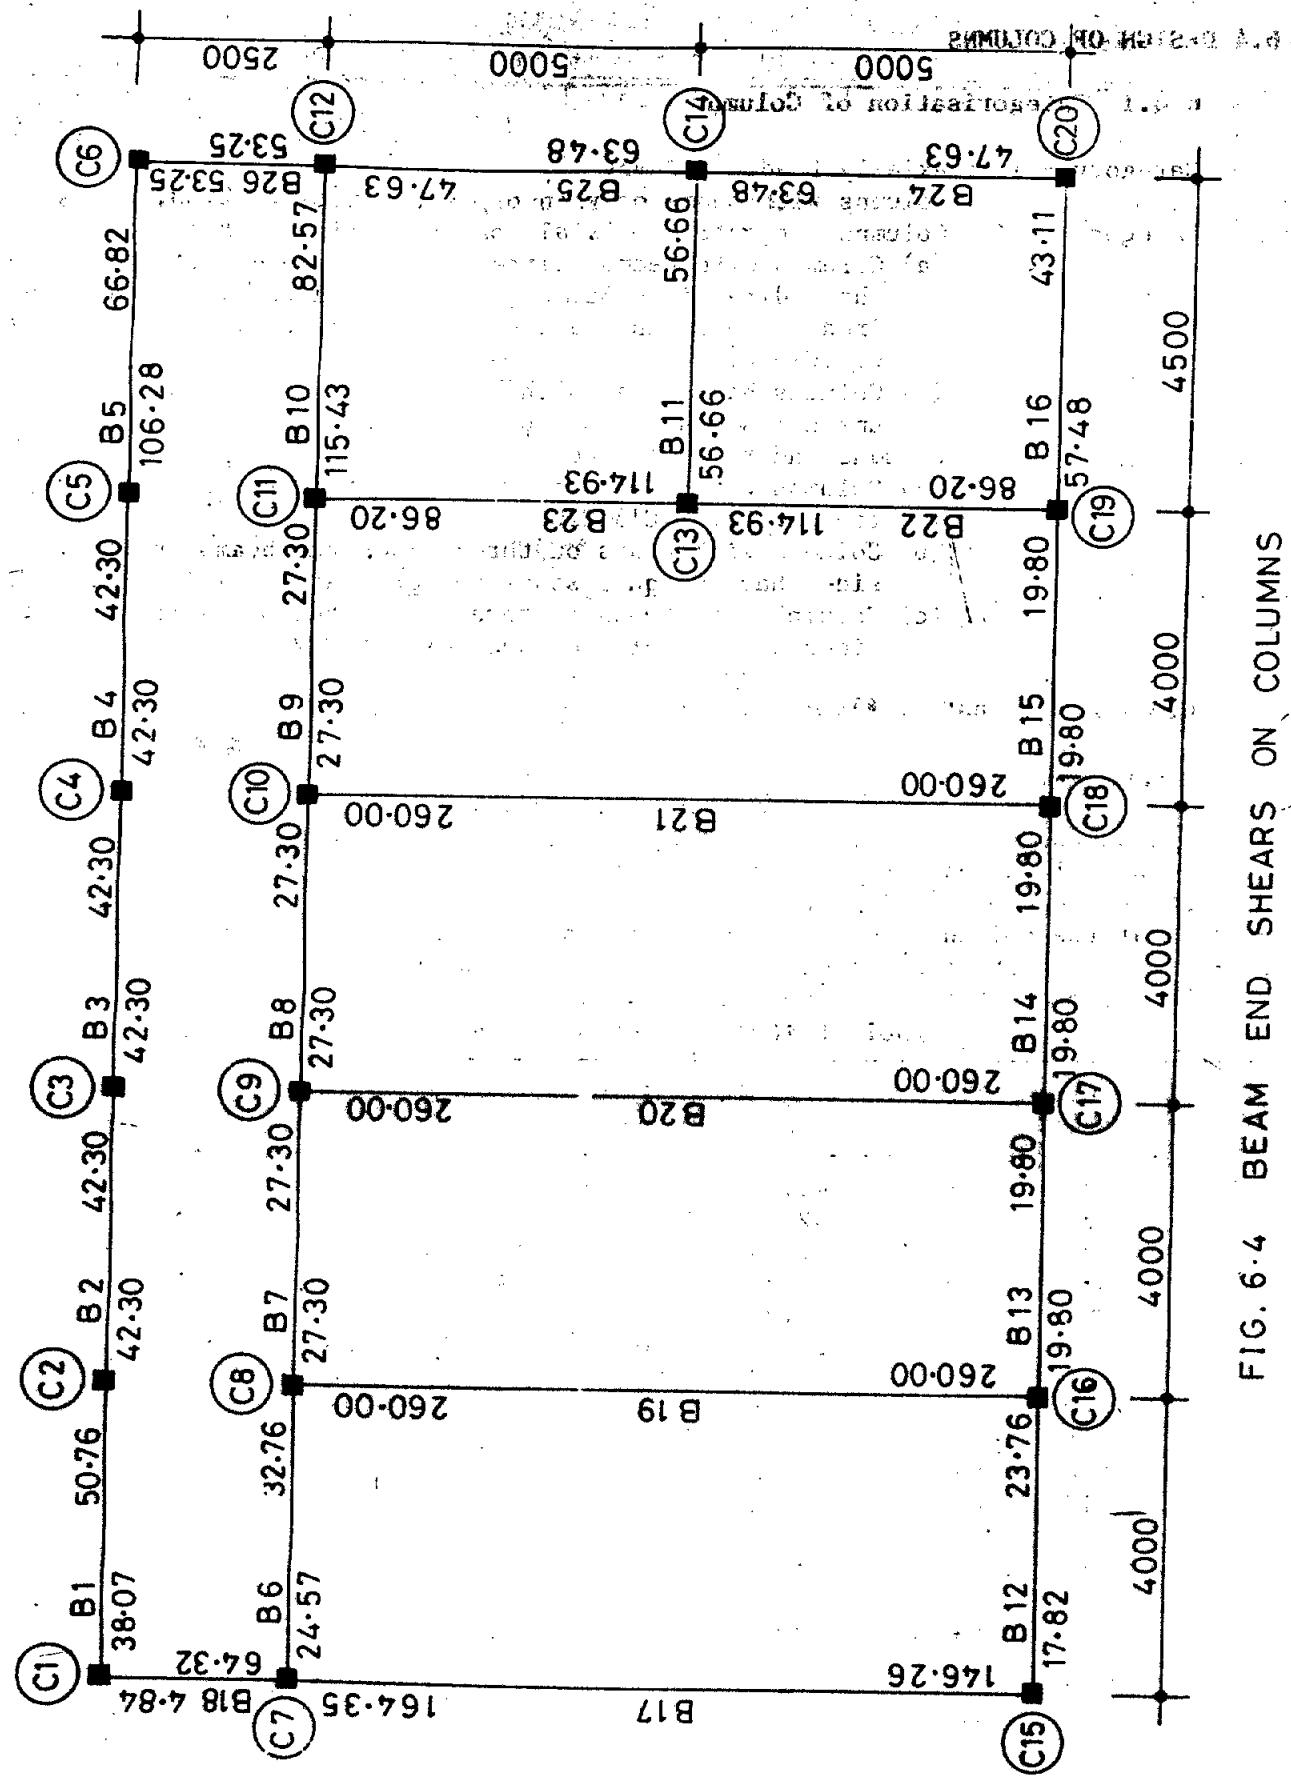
BEAM END SHEARS ON COLUMNS
